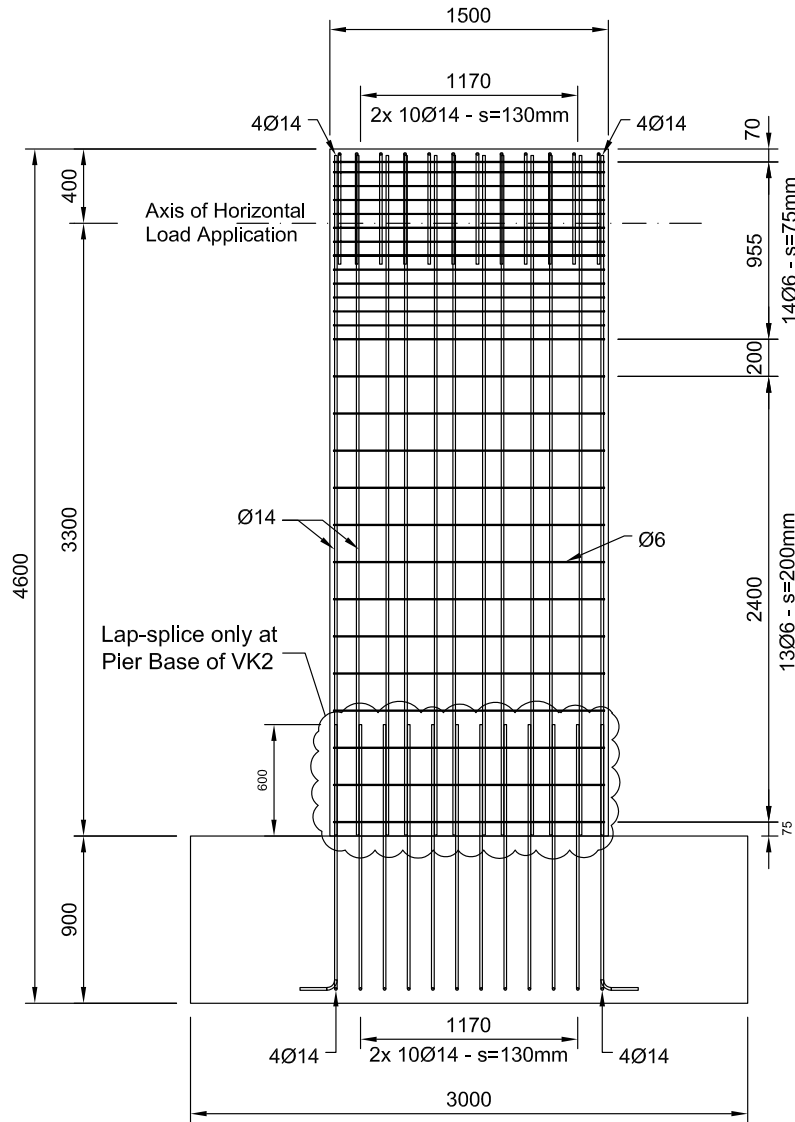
Elevation with reinforcement layout of Test Unit VK2 featuring lap-splice at the pier base (all dimensions in mm)
